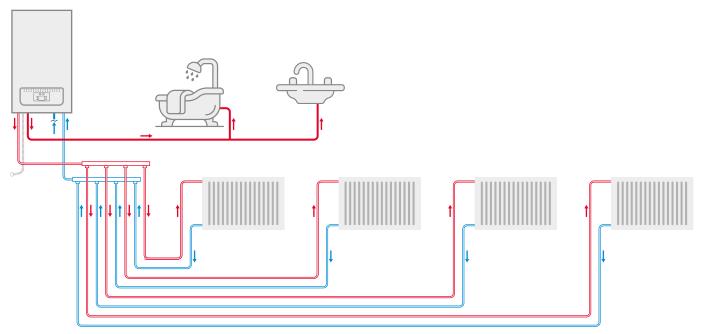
Scheme of use of the boiler in a mobile tubular distributed heating installation systemi
